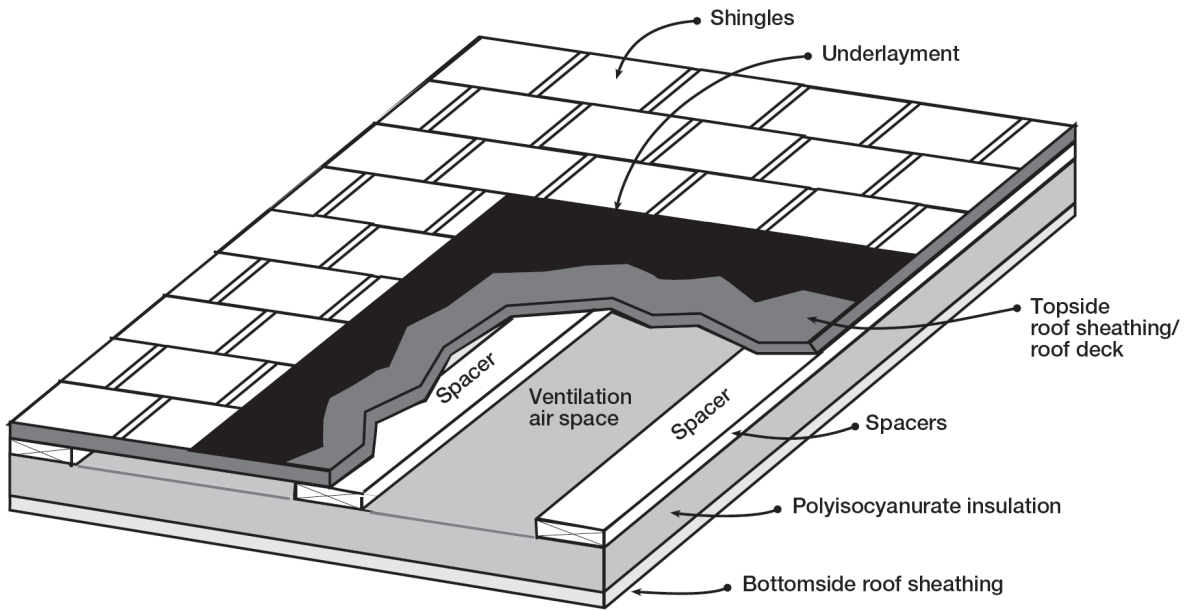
Figure B: Complete roofing assembly using a generic ventilated roof deck system
